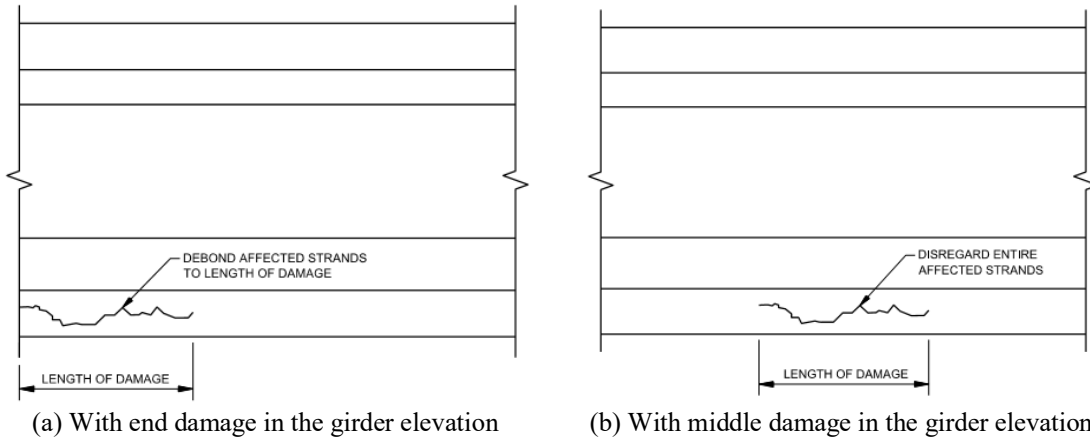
Prestressing strand disregarding procedure for PC-I girders based on the damages in the span (UDOT 2017)
